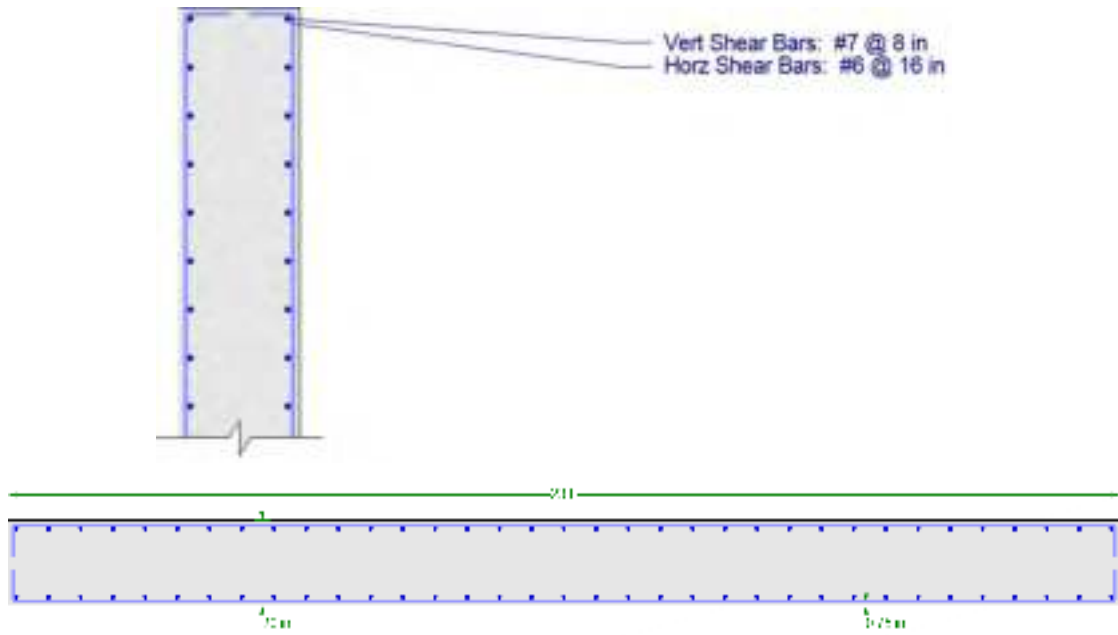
Building (B9-12S-H-S) Special RC Shear Reinforcement Details; Wall Section for Floors 7-9
